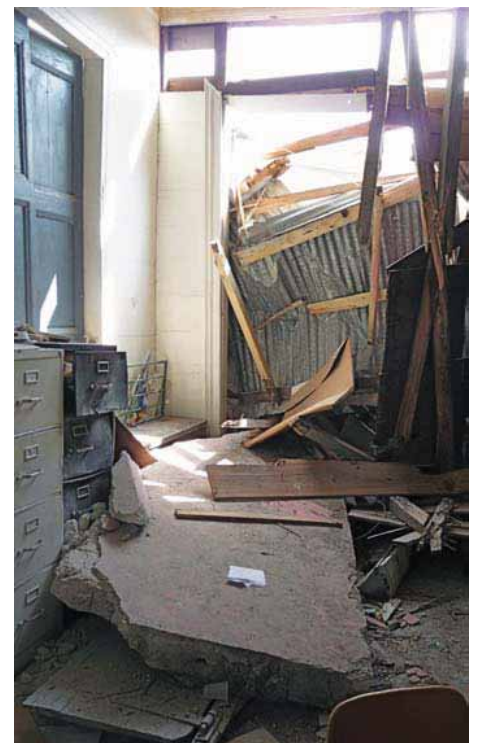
The most damage this Gingerbread suffered was from a concrete slab ejected through its back door from the collapsed concrete building behind. The building's front porch roof was also damaged, by a collapsed concrete building to its side (see Figure 82, page 40).
